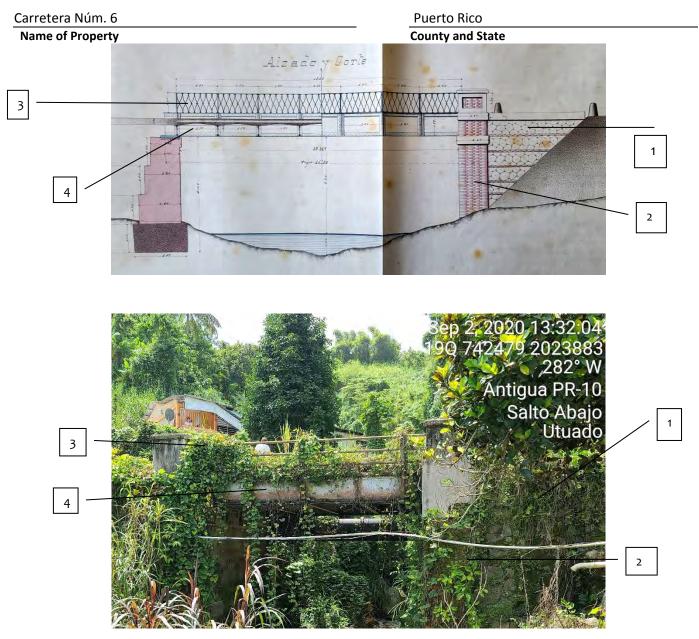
Above, partial view of an 1891 drawing done by engineer Pedro F. Fernandez to be used as model for a ten-meter span bridge with a tramo metálico.33 Below, an 8.5 meters span bridge in the Utuado-Arecibo section, on which the major structural components from the 1880's still present: 1) masonry abutments; 2) brick columns; 3) metal railings; 4) full body (alma Ilena) longitudinal iron beams. Although not depicted in the 1891 drawing, been a ten meters span bridge required supporting transversal (not longitudinal) iron beams. The photo below shows the transversal beams for this particular structure. (Photo, Juan Llanes Santos)
